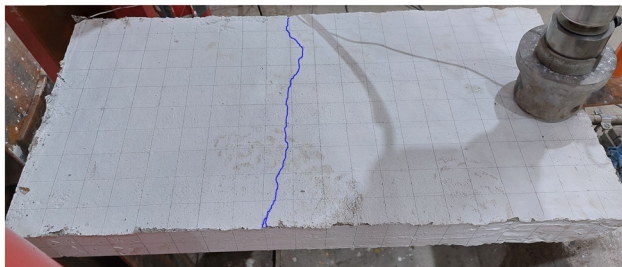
Shape of cracks in reinforcement concrete slab in CM2.
